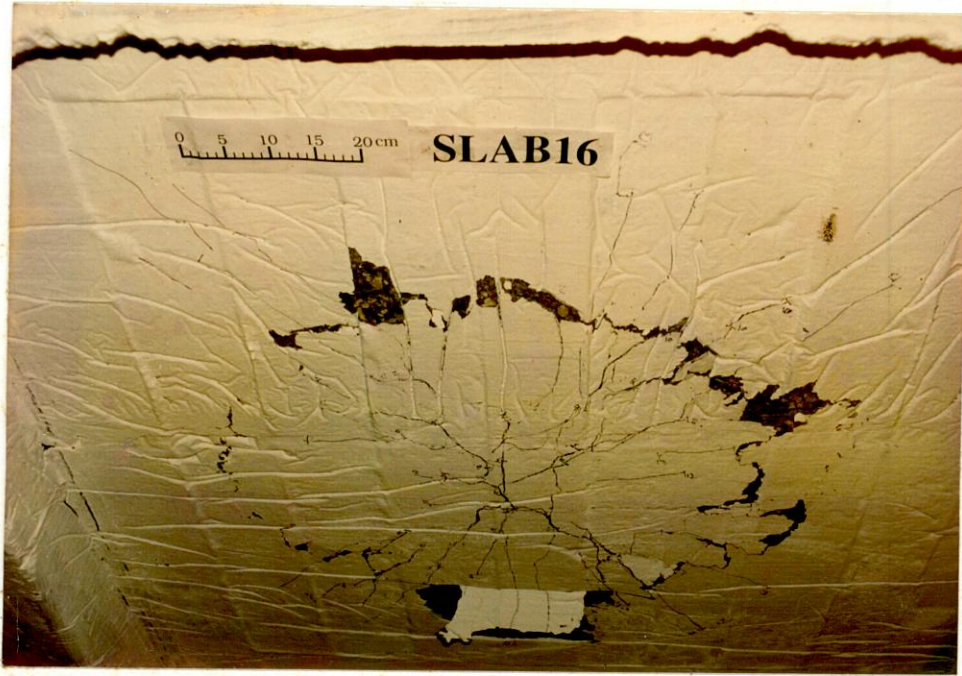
Cracking pattern of bottom surface of SLAB16
